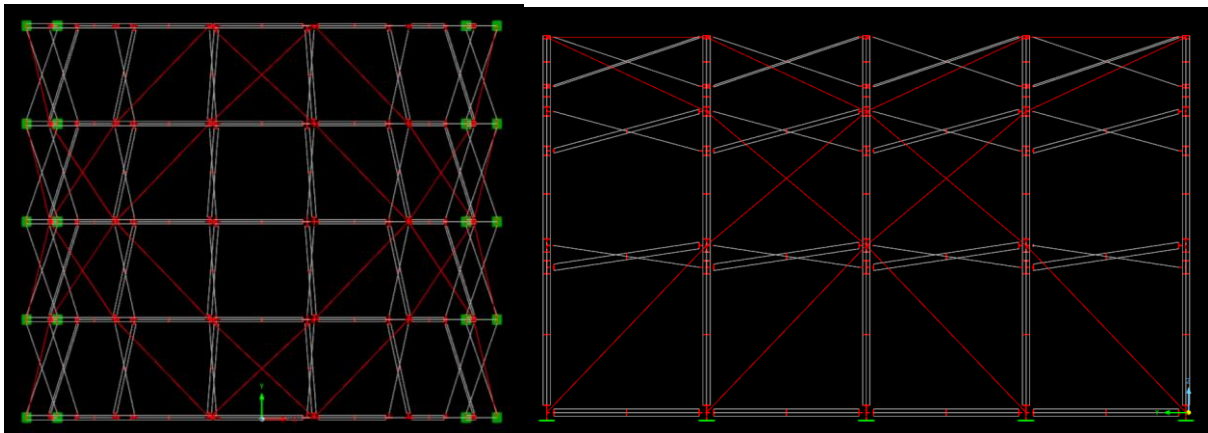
Bracing system of the structure highlighted in red, shown in top and side views.
